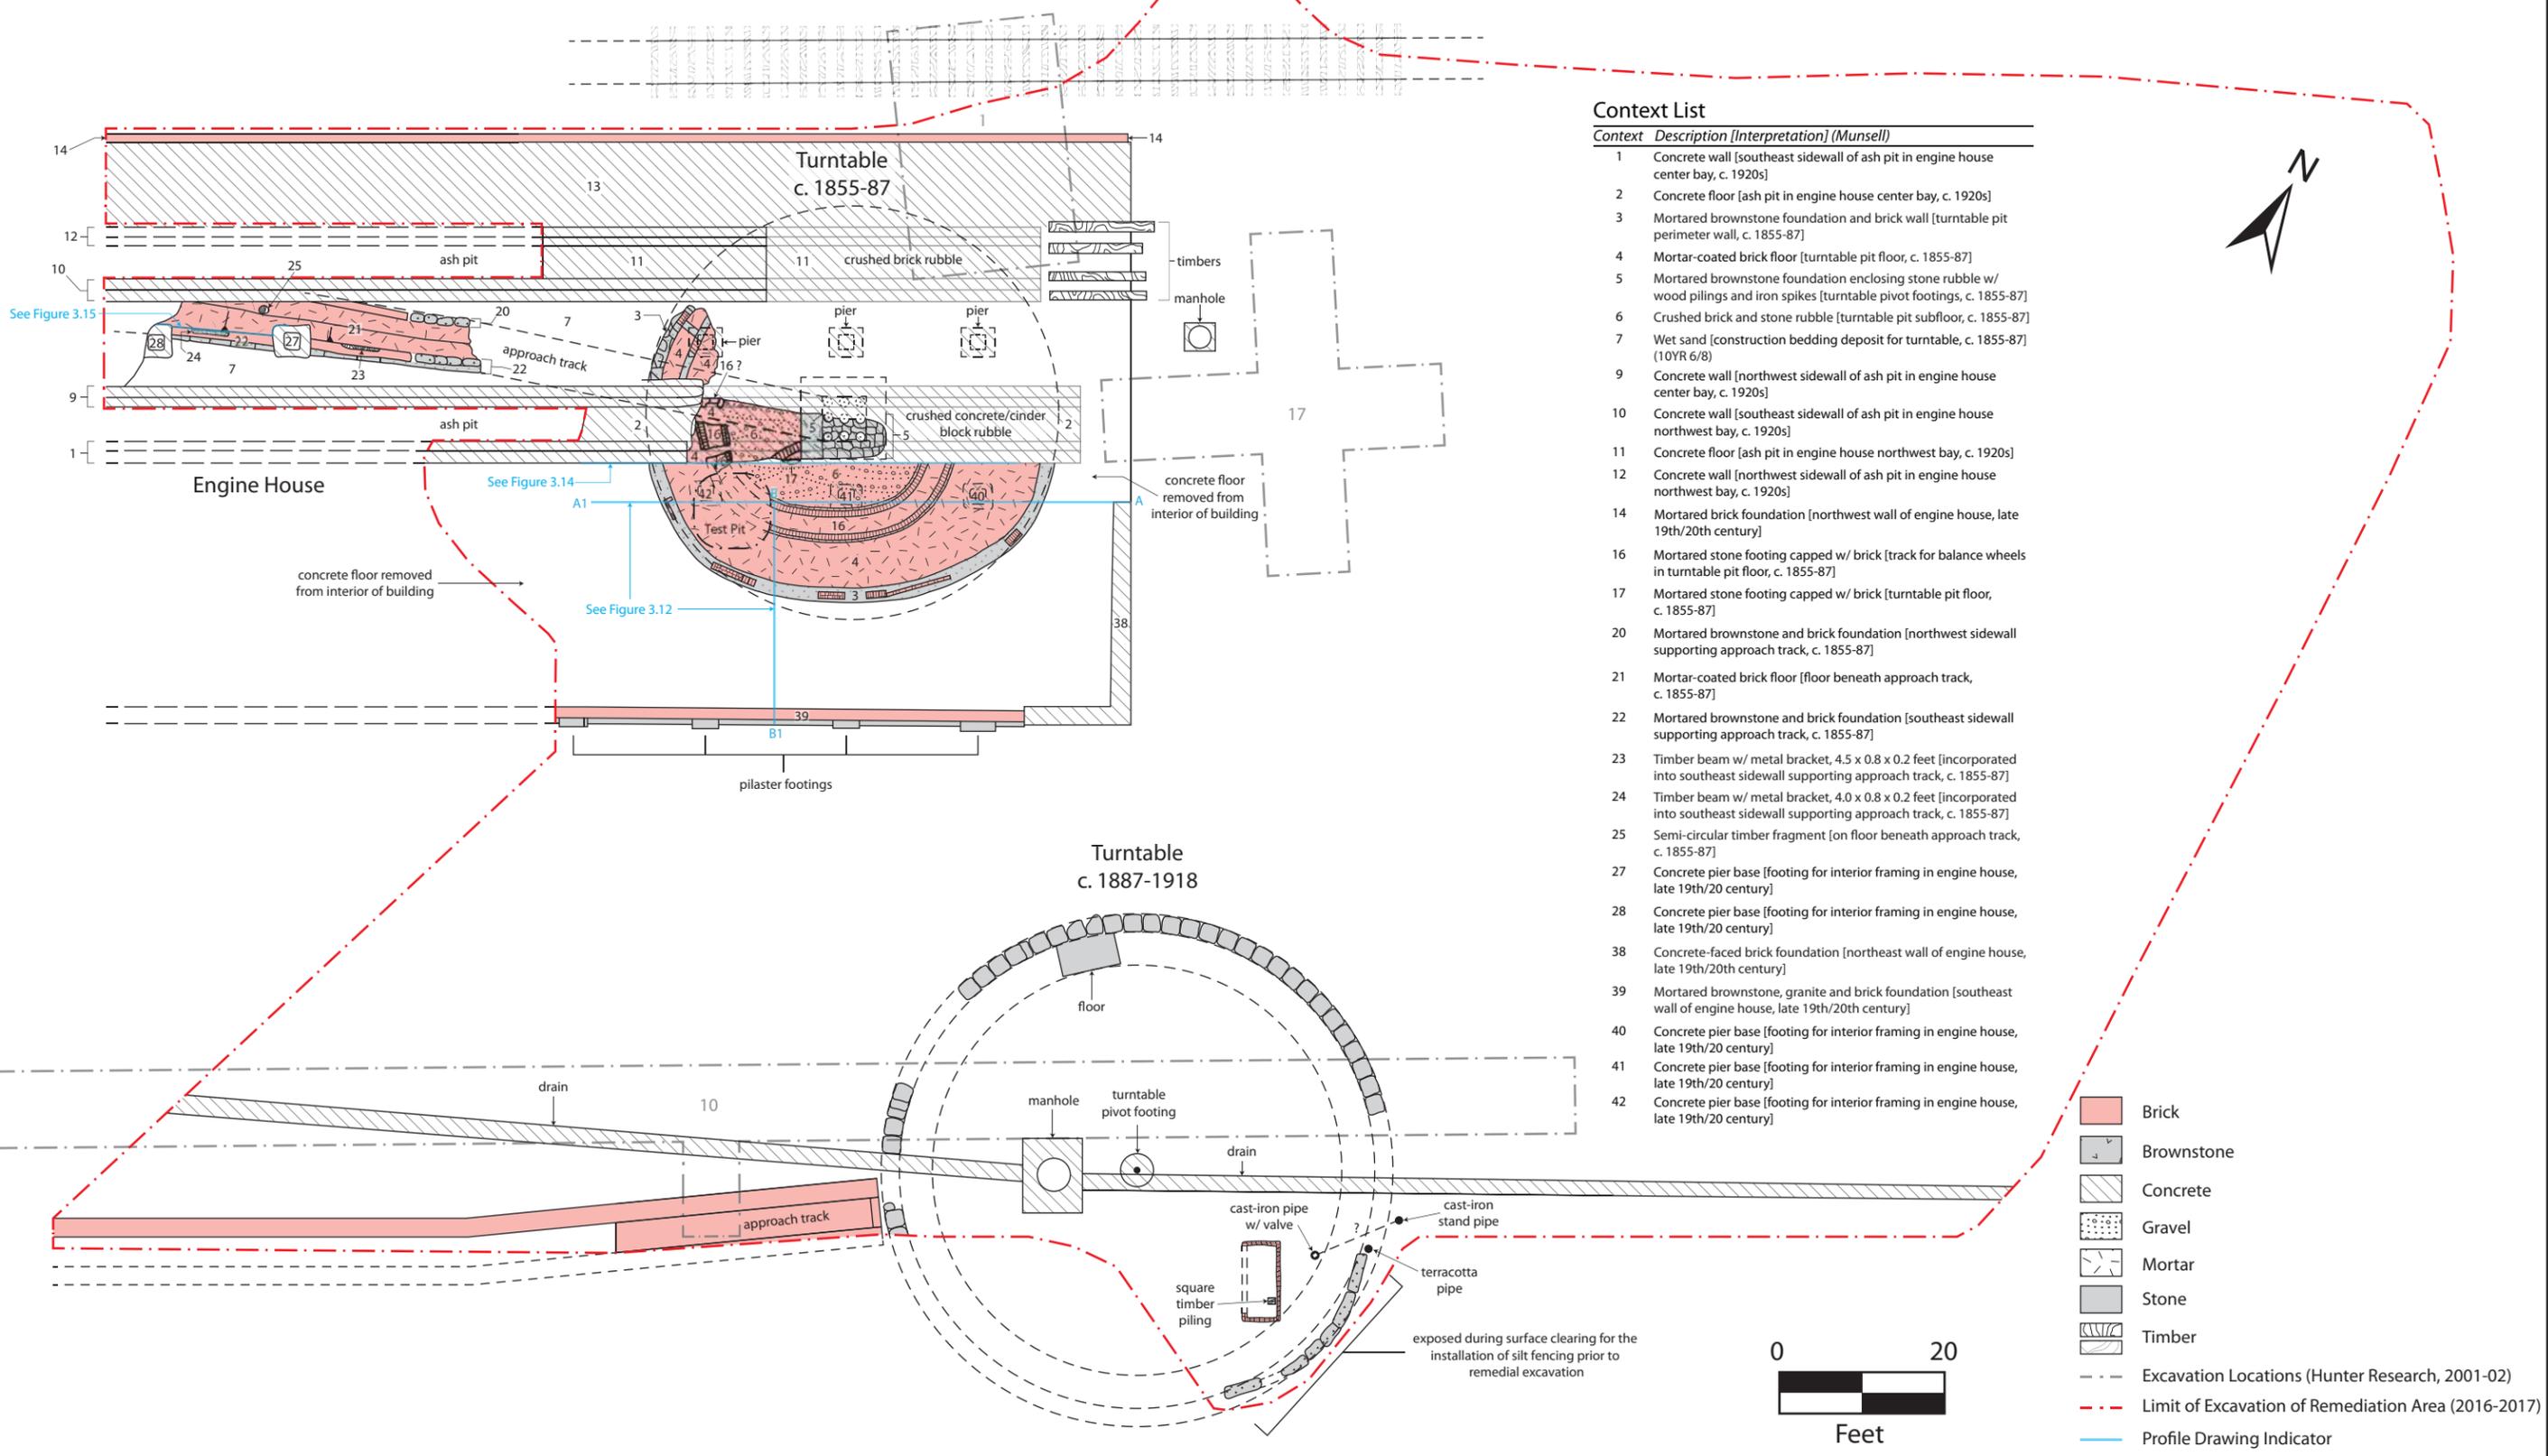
Remedial Area 15, Site Plan, Turntables and Northeast End of Engine House.
